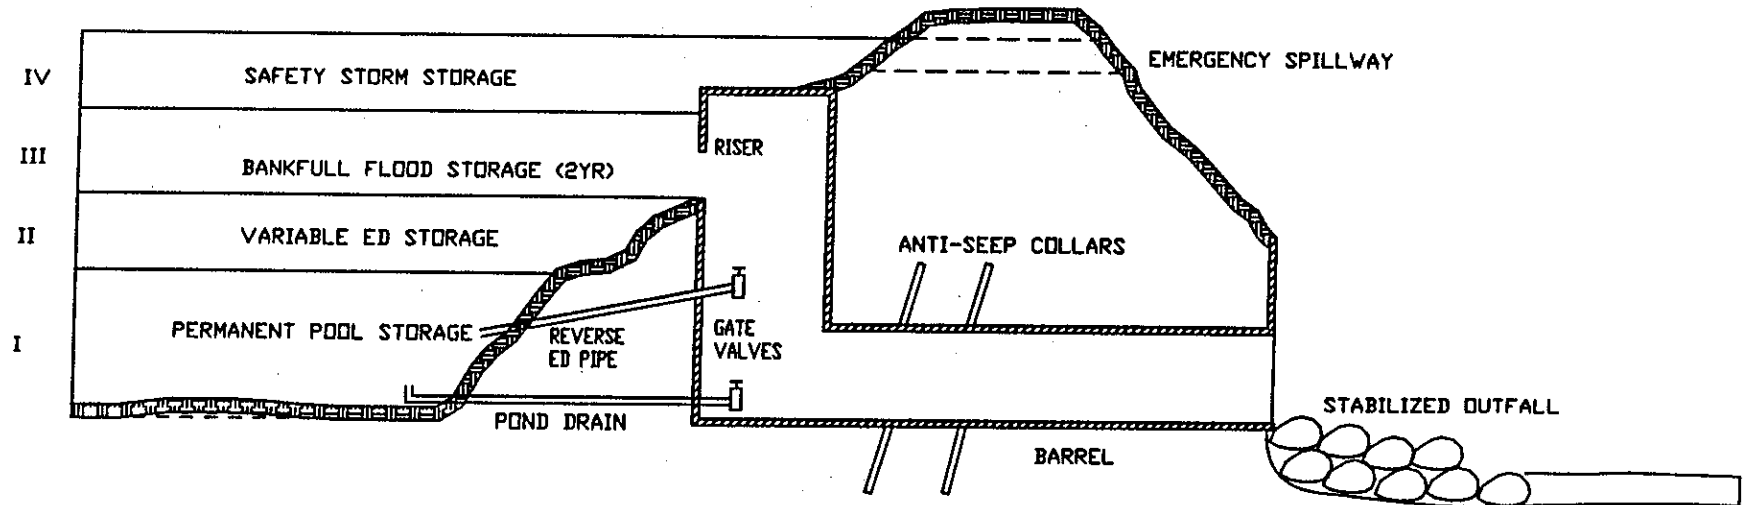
CROSS-SECTION VIEW OF A STANDARD ED POND SYSTEM DESIGN
